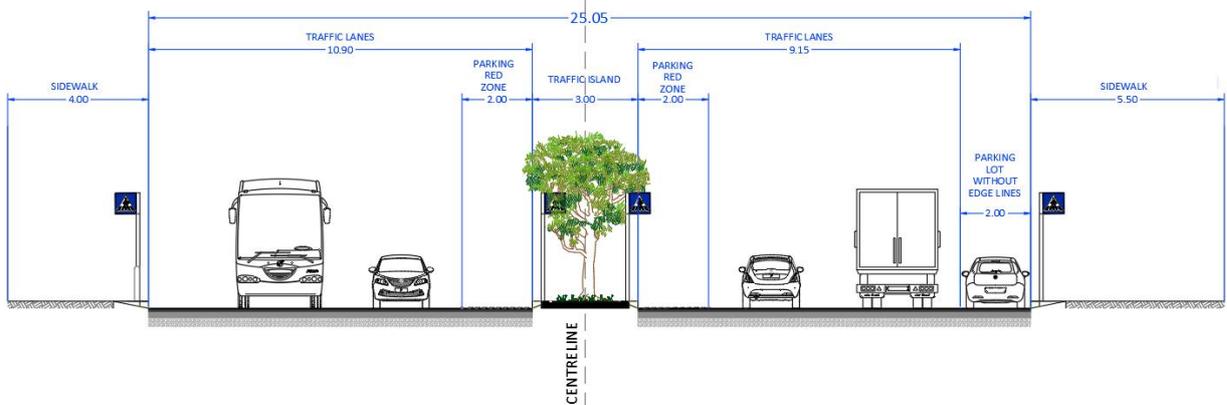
Cross section, section S - S'; road segment of Viale Papa Giovanni XXIII.
